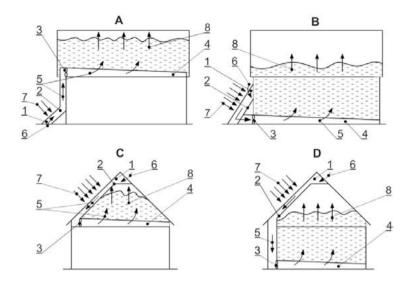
Basic rules for installing solar collectors in farm buildings; A – wall collector with drying room in the loft, B – wall collector with dryer in the barn, C – under floor collector with drying room in the loft, D – under roof collector with drying room in the barn: 1 – air inlet, 2 – collector, 3 – fan, 4 – distribution channel, 5 – heated air, 6 – ambient air, 7 – solar radiation, 8 – humid air
